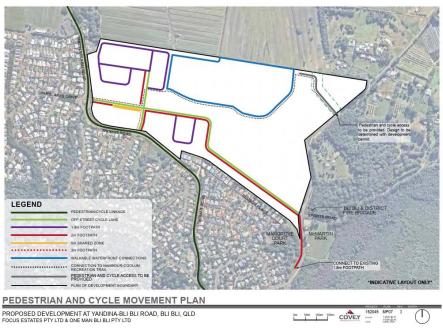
Proposed Pedestrian and Cycle Movement Plan
